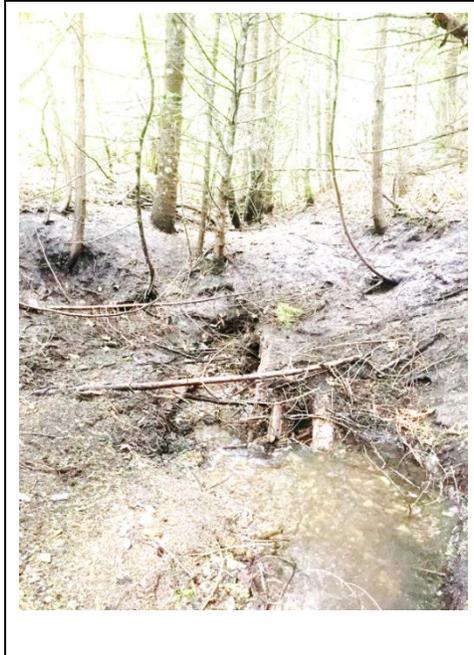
Failed log culvert on jammer road in Upper O'Brien Creek jammer road system.
